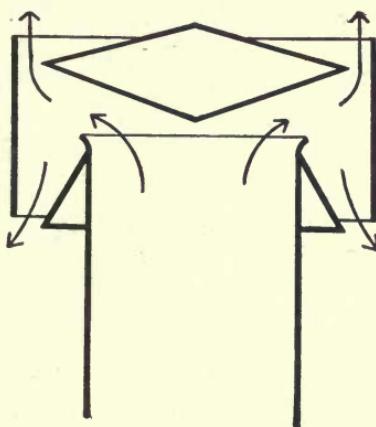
Section Showing Simple Form of Protecting Hood for Vent Carried through Roof.
